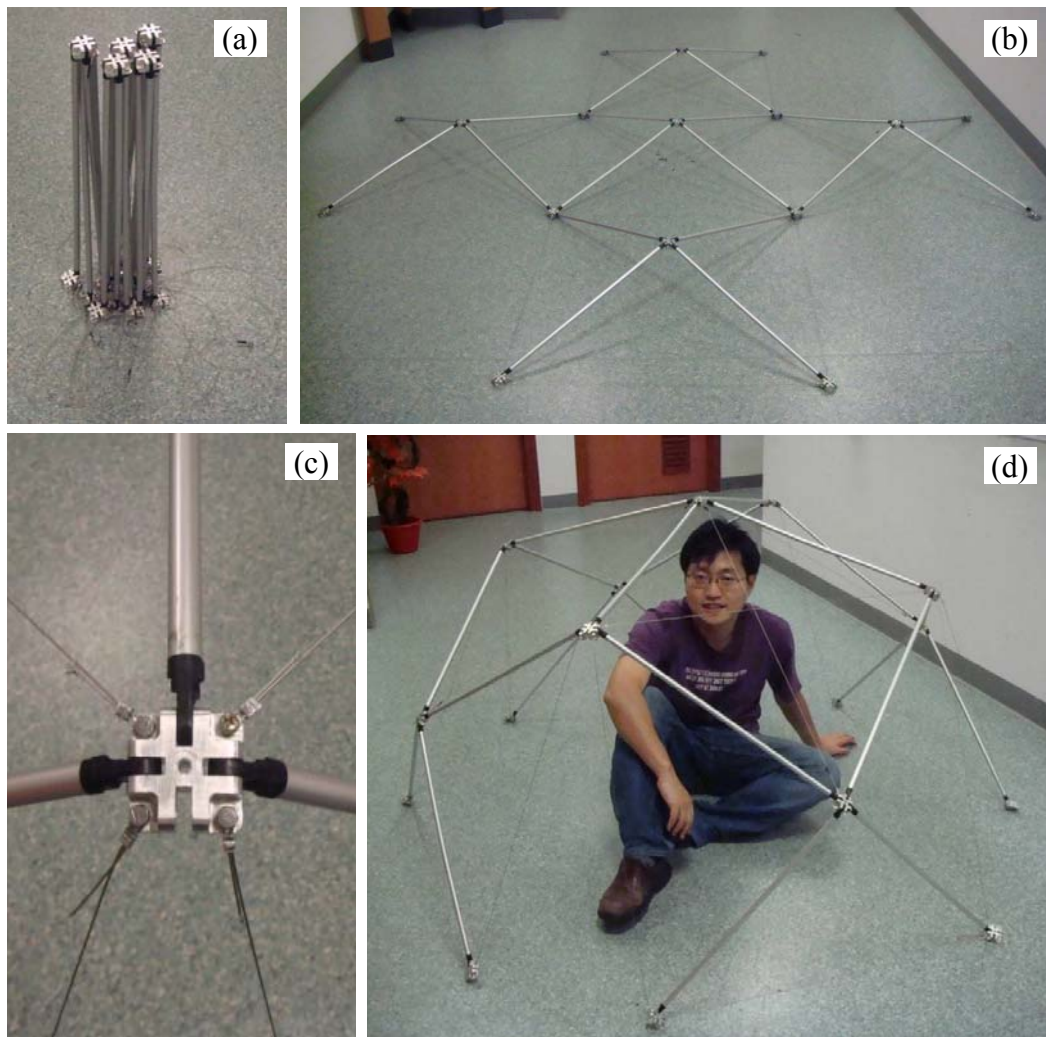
Prototype of a dome-shaped DCCS: (a) compact state; (b) during deployment; (c) joint details; (d) deployed state.
